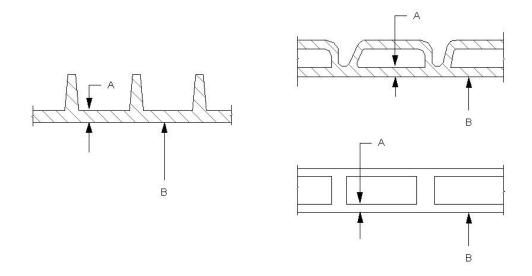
Typical Profiles (Cross Sections): A-Waterway Minimum Wall, B-Average Inside Diameter (Other Configurations of Ribs and Spacing Are Permissible) (AASHTO M 304)
